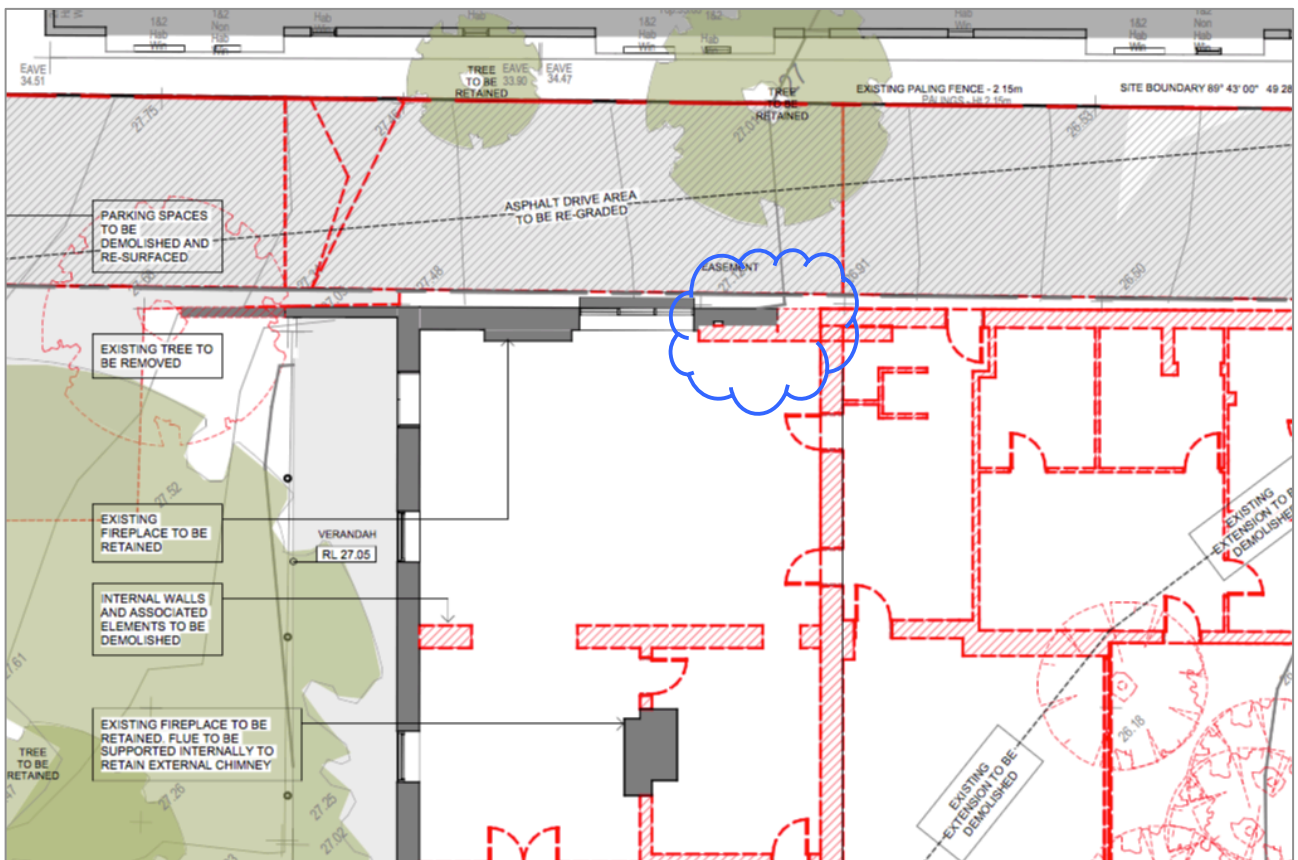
Extract of drawing TP04 - Demolition Plan Ground Floor – area of original wall still identified as being demolished shown within the blue cloud.
